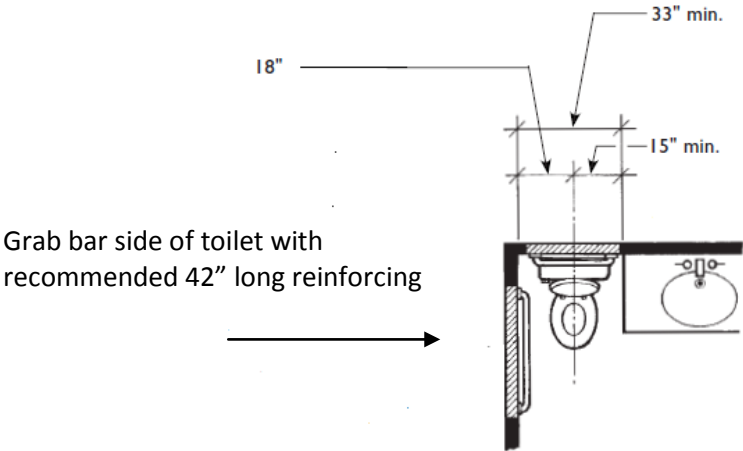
Toilet Placement at Adjoining Walls and Fixtures
